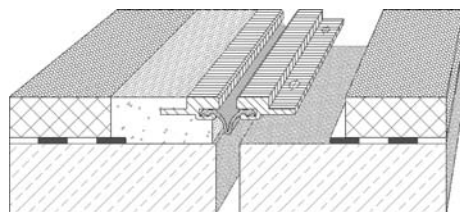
Schematic detail of *TensaCrete* expansion joint.
